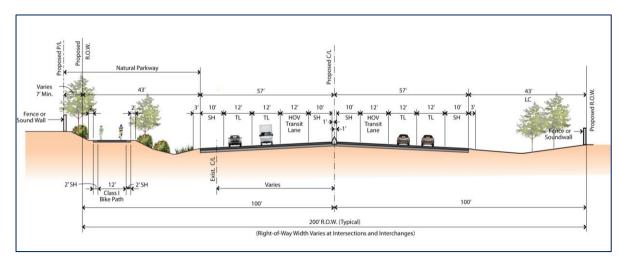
White Rock Road (Future Capital Southeast Connector Expressway
